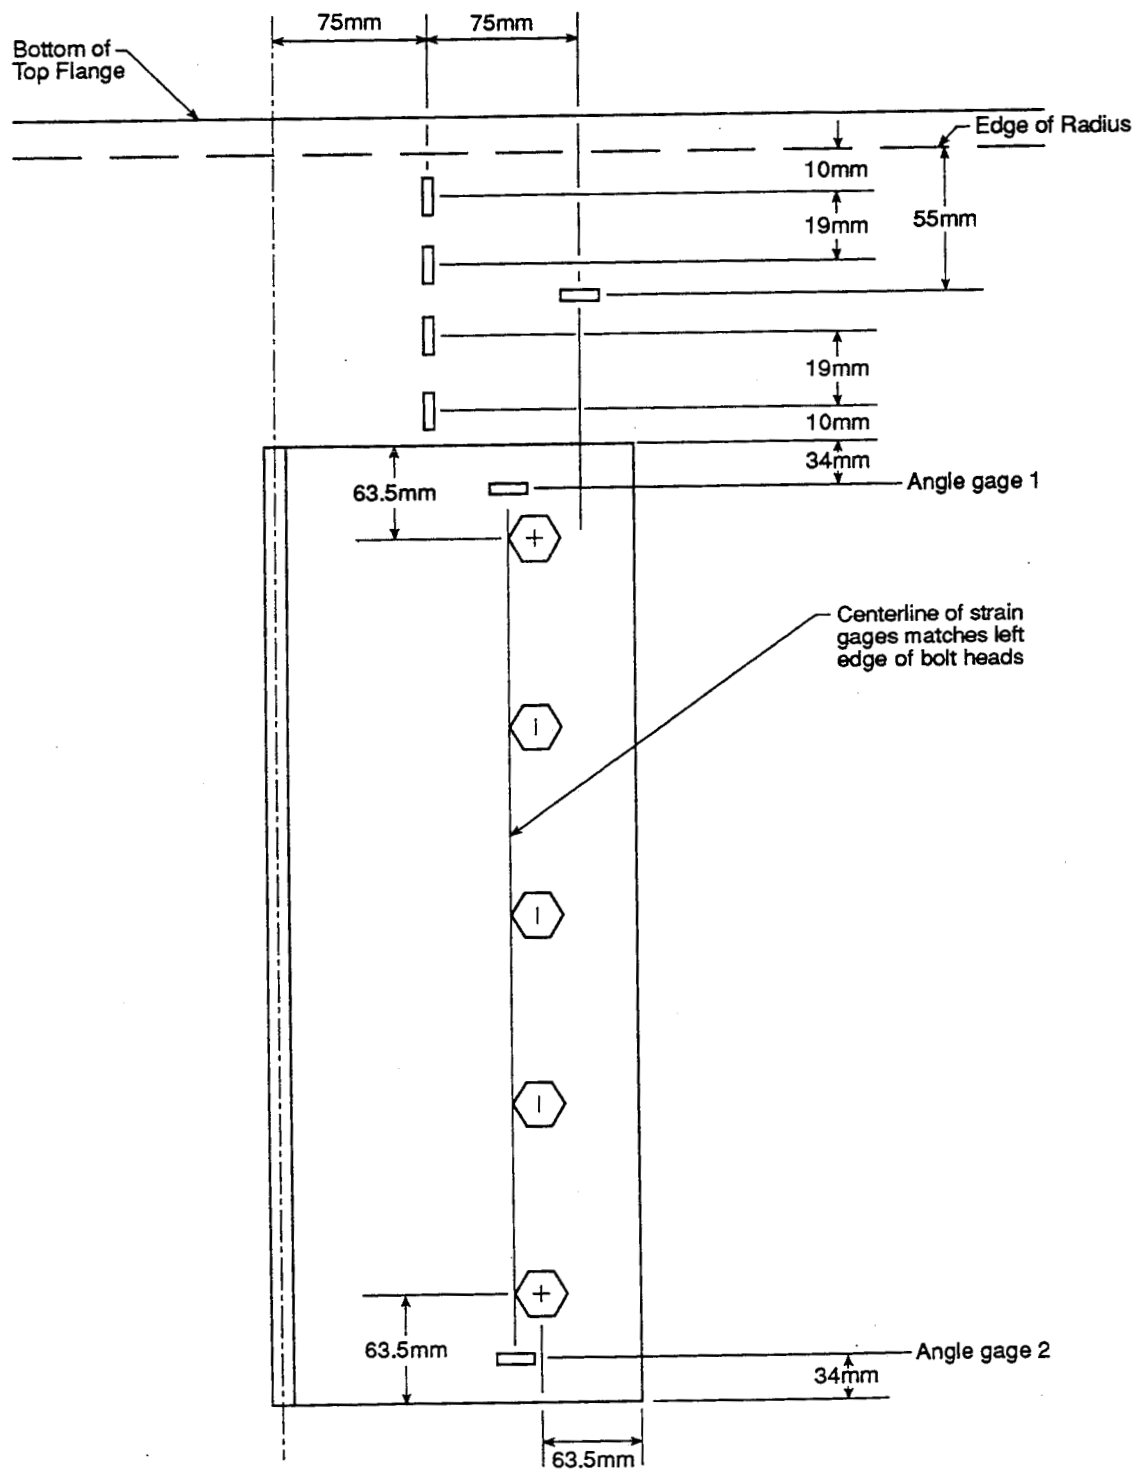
Gaging Pattern for Type G Connections on Inside Girders
